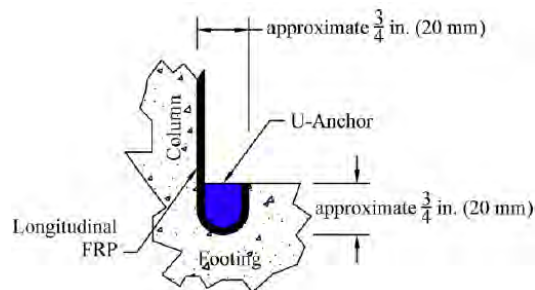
Anchor for the west and east longitudinal CFRP (He, 2013)
